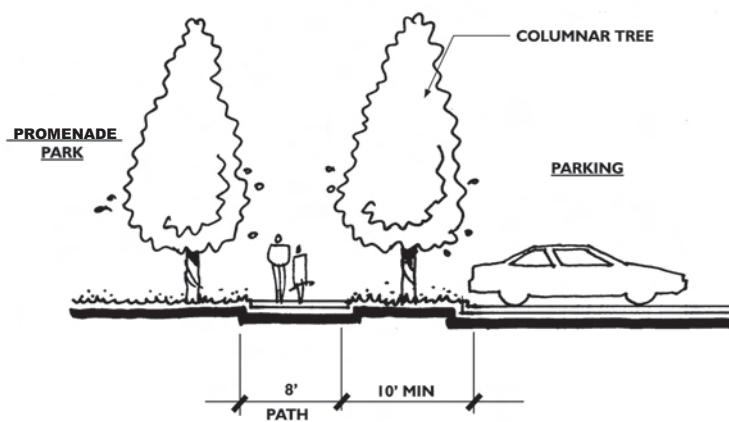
D.67: Cross Section of Buffer Between Parking and Path Along the Edge of Promenade Park
